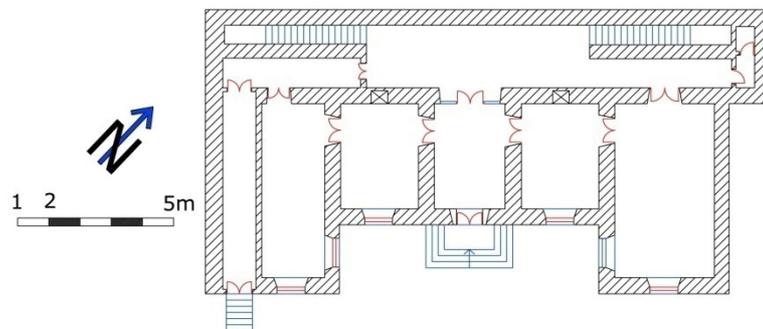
Ground floor plan, Source: Kasmaei 2005, p.85 (my drawings)
